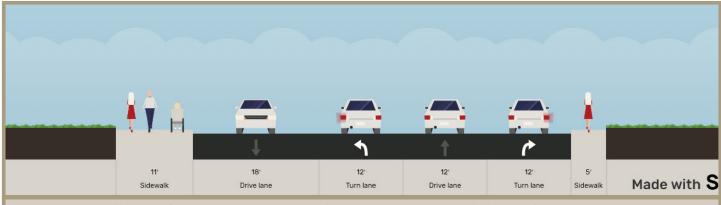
Current allocation of space on Prospect Avenue at the Essex Street intersection, looking south.
